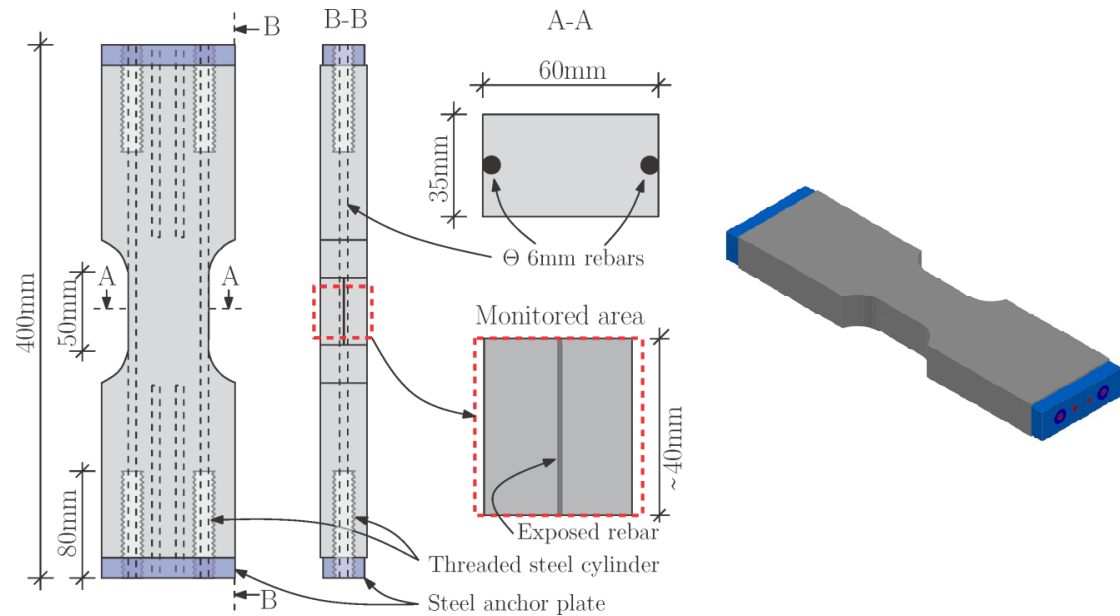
Geometry and layout of reinforced prism used to evaluate the rebar-matrix interface in tensile loading.
